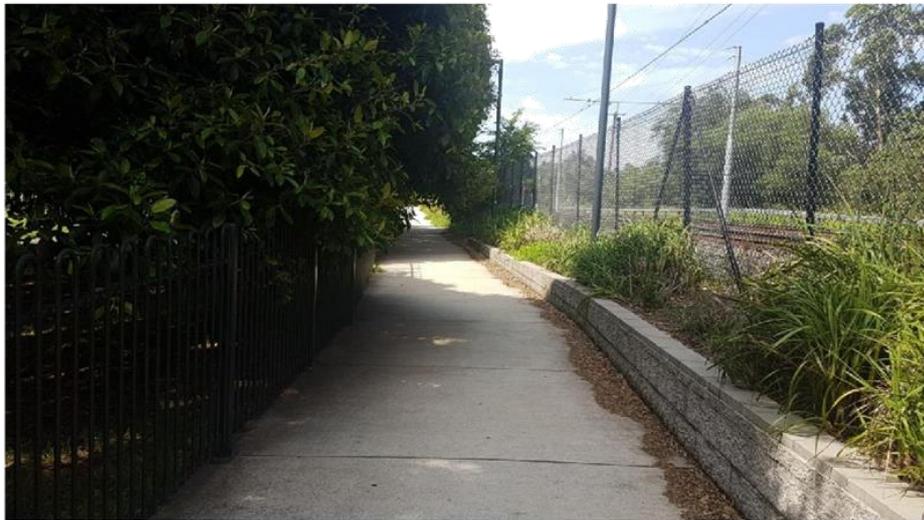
Photo showing shared pedestrian/cycleway ramp at light rail crossing.
